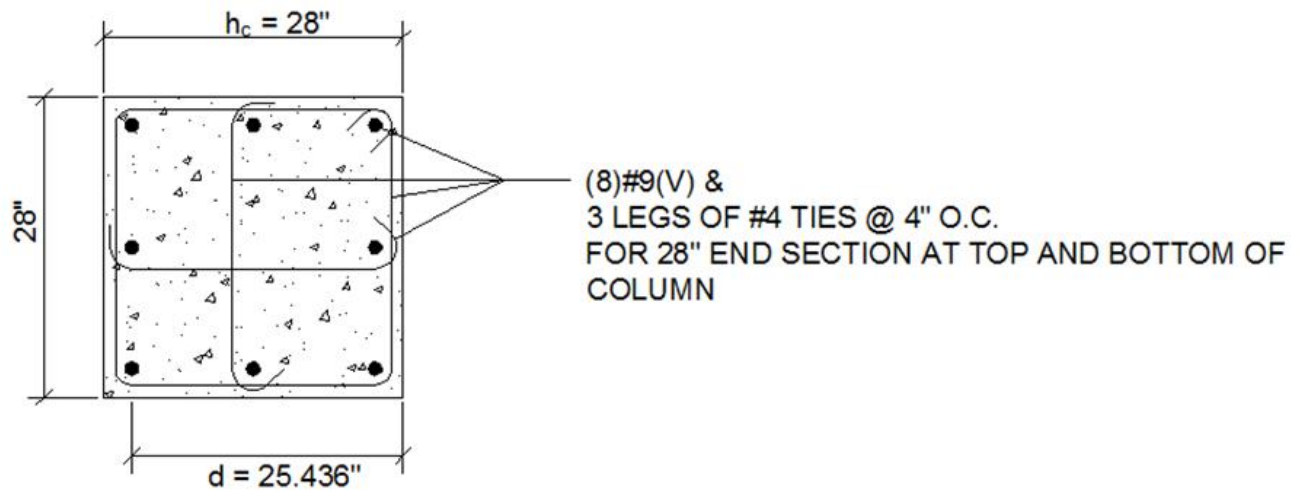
Exterior column, cross-section at end of column at 2nd – 6th floor levels based on SDC D design.
